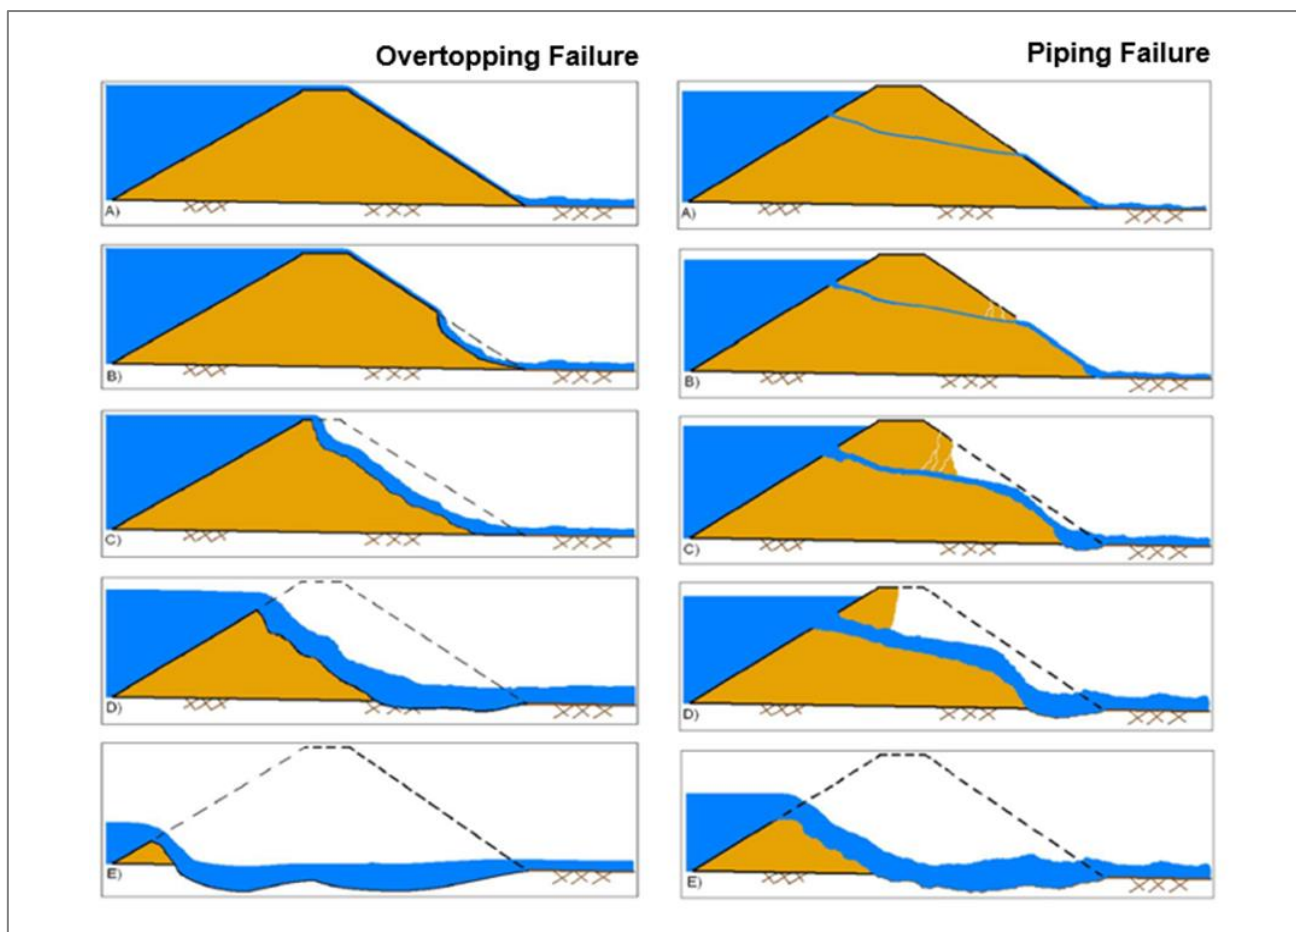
Overtopping and Piping Failure Configuration (US Army Corps of Engineers 2014)
